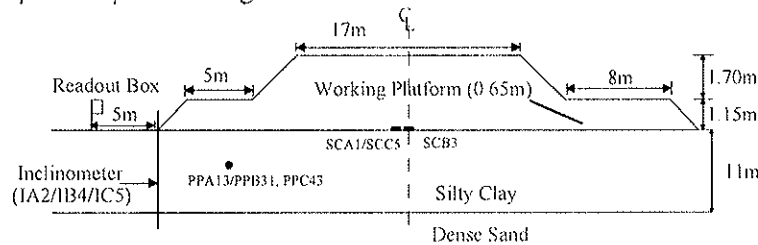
Cross-section of embankment with selected instrumentation points (adapted from Rankine et al 2008)
